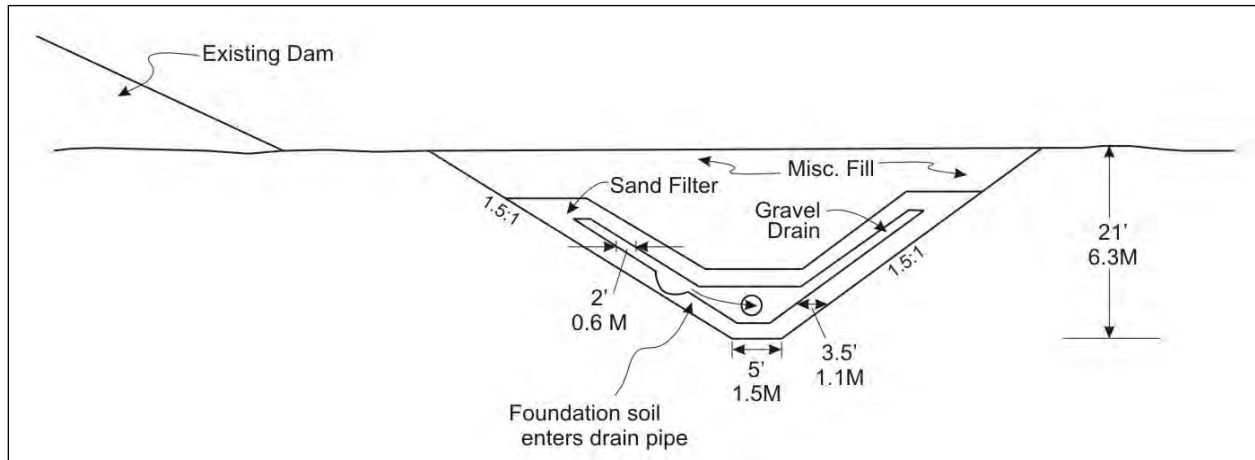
Foundation soil passes through gravel drain and enters drain pipe.
